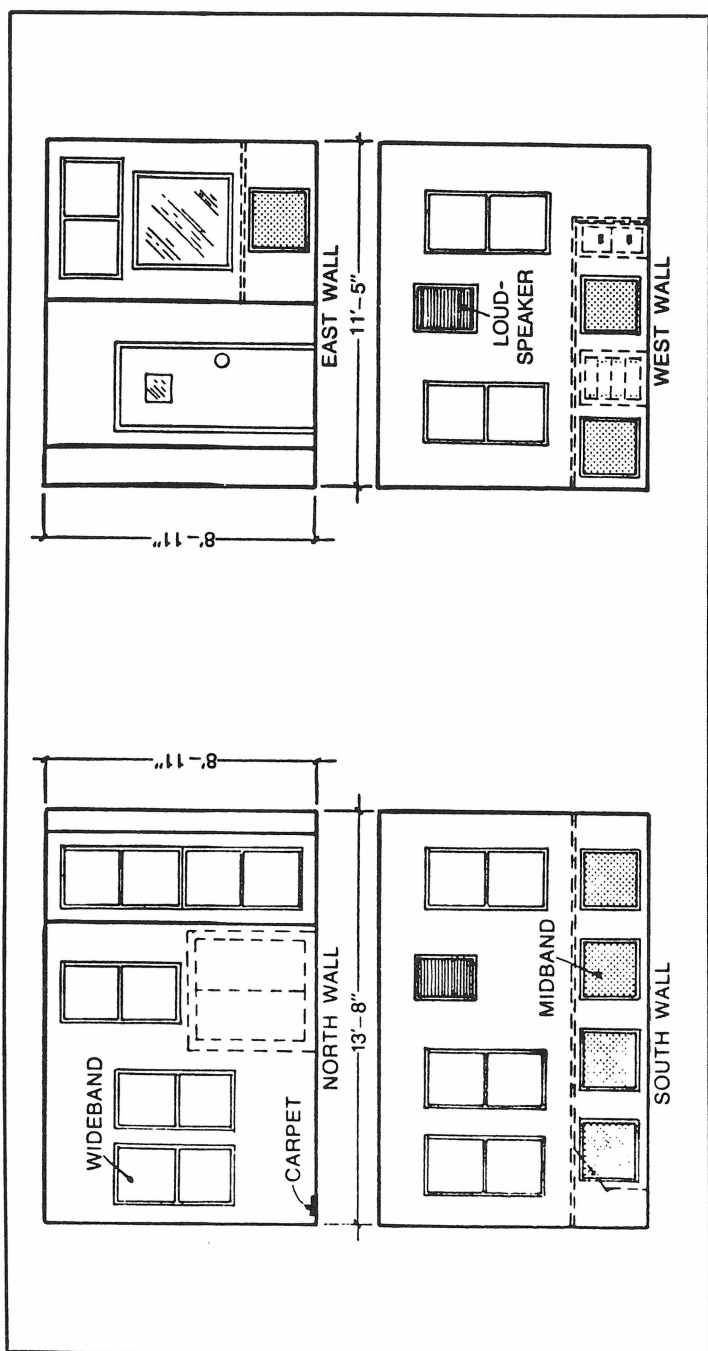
Wall elevations of control room showing placement of wideband and midband absorbing units.
